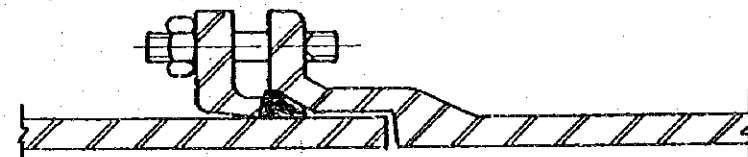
Ductile Iron Pipe with Mechanical Joint
